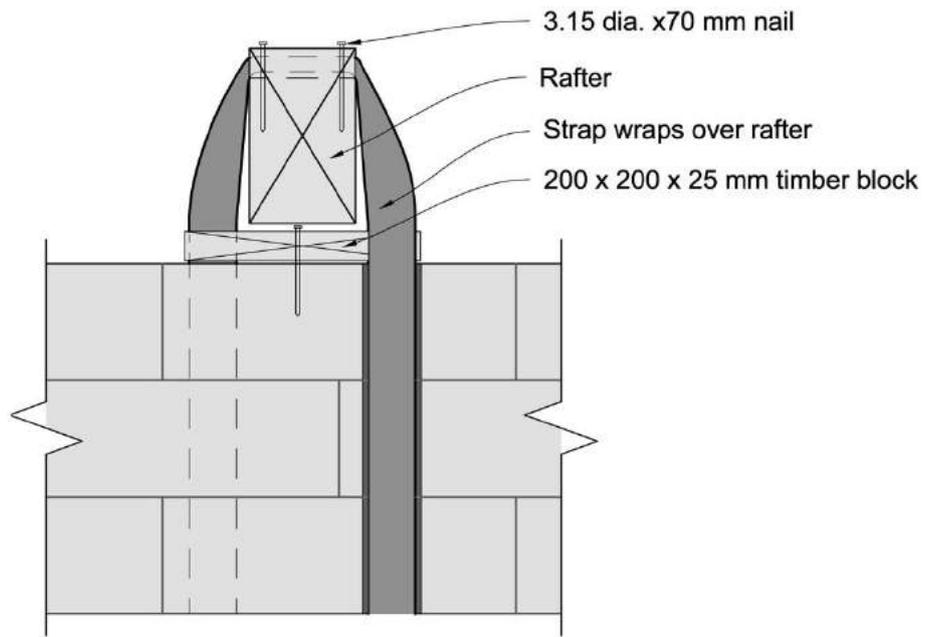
A vertical strap wraps over a rafter. Its location in a shallow notch prevents the rafter falling from the wall. In an existing house an area of roofing needs to be removed to achieve this detail.
